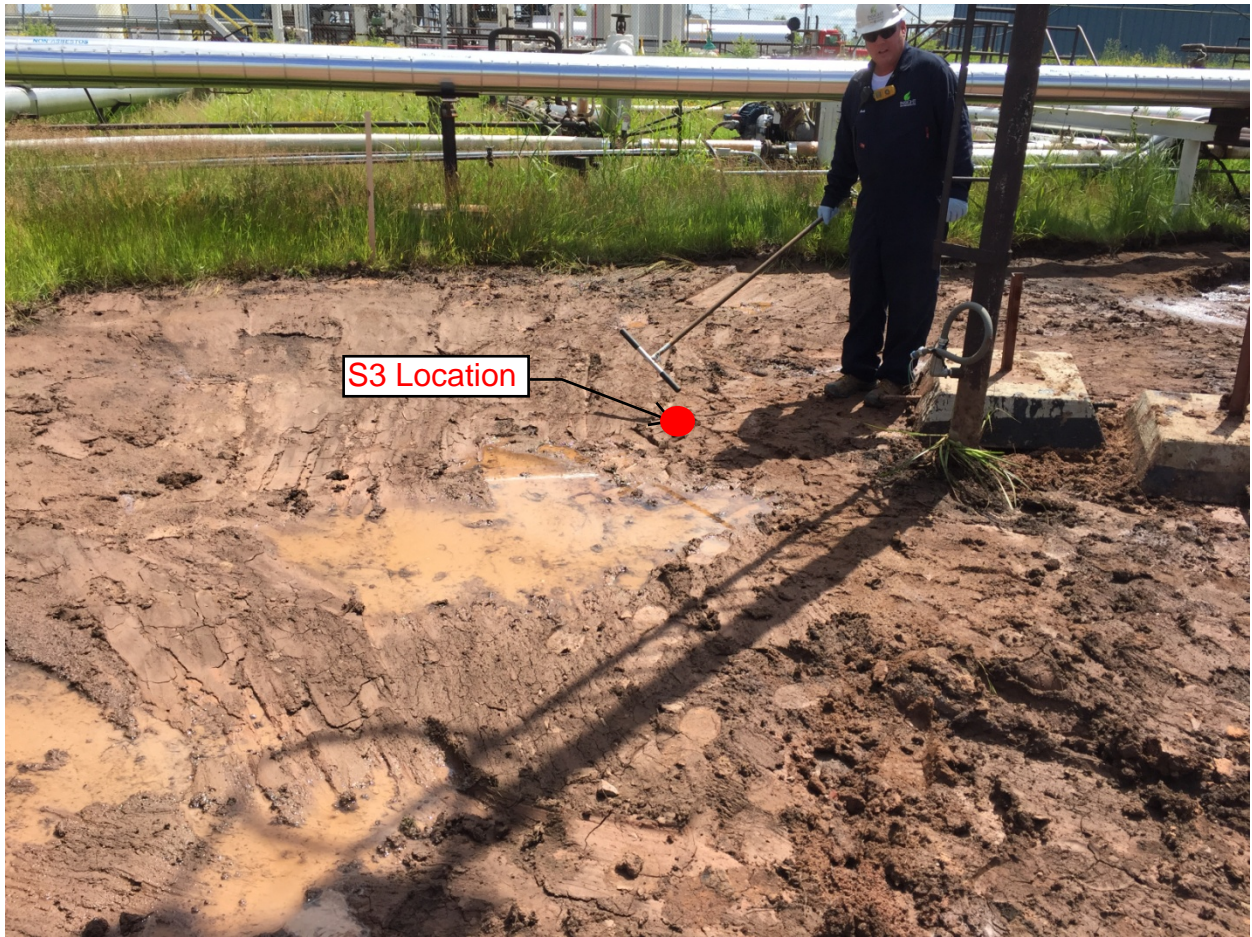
Looking south at the sample location S3 after the final round of excavation.
